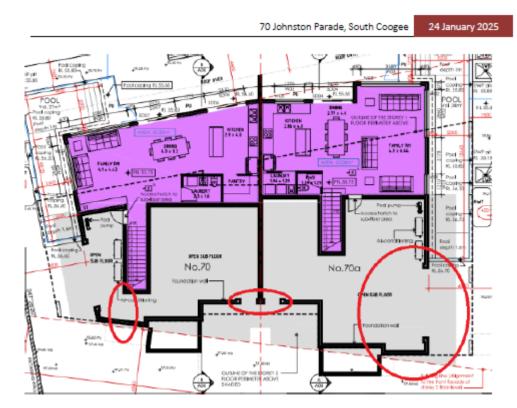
Approved ground floor plan under CDC-262960 dated 19 December 2024. The red circles indicate the additional external enclosing walls greater than 1.4m in height creating GFA. Source: Drawing No. DA13 Revision A by Edifice Design. Markup by CPS.
